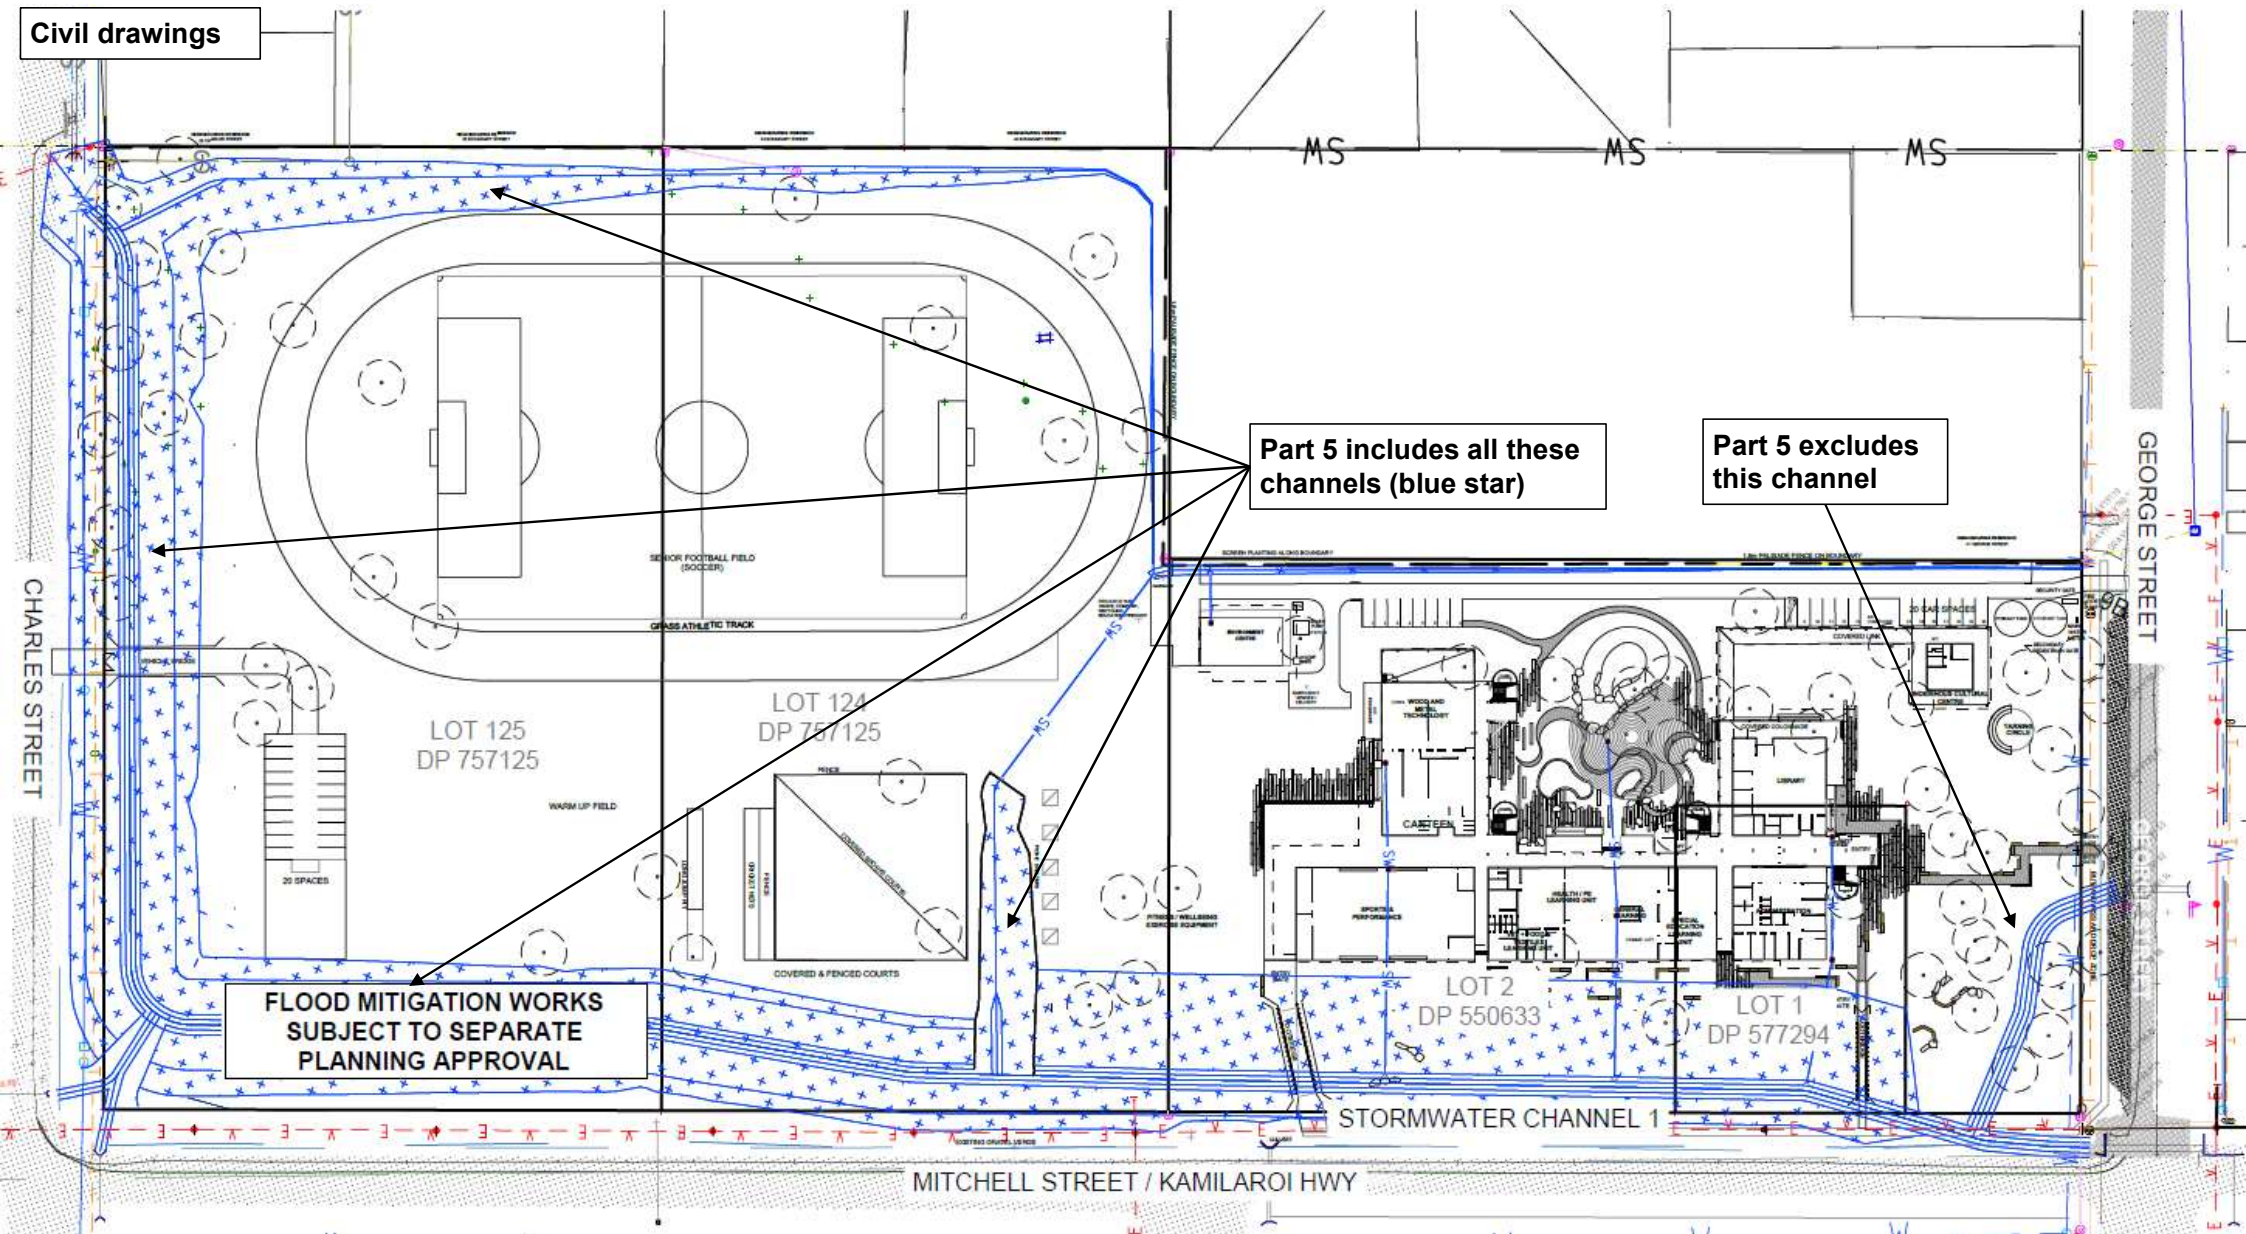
Flood Mitigation Works Under Separate Planning Pathway: On-Site and Surrounding Works
